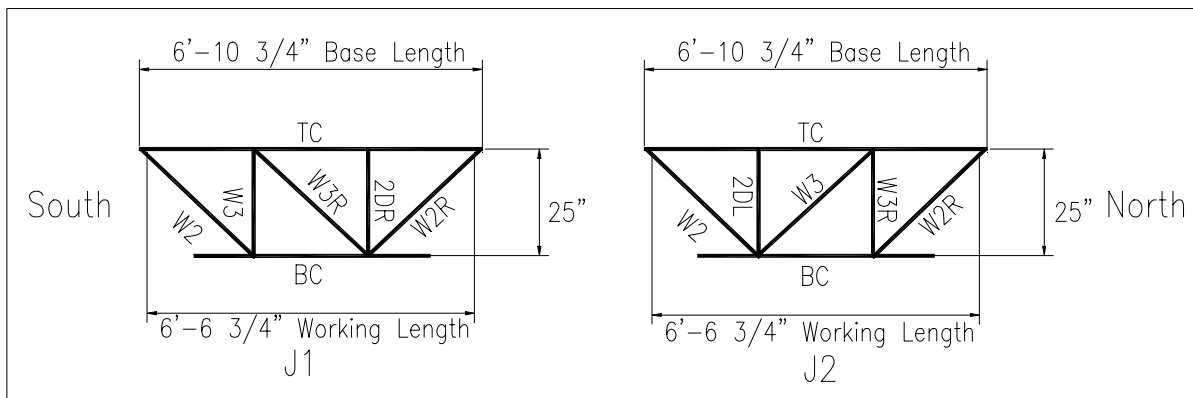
Flush-Framed Joist Nomenclature (FF-1)
